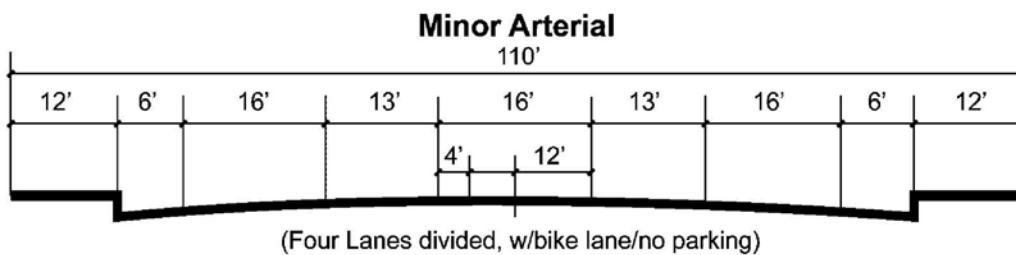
CITY OF RANCHO MIRAGE GENERAL PLAN ROADWAY CROSS-SECTIONS
